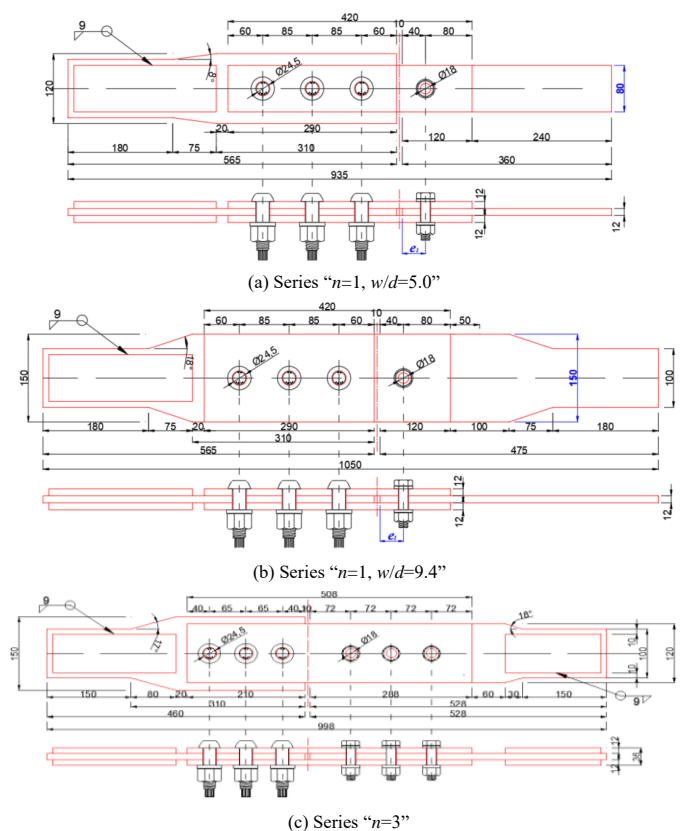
Geometrical dimensions of specimens (unit: mm)
